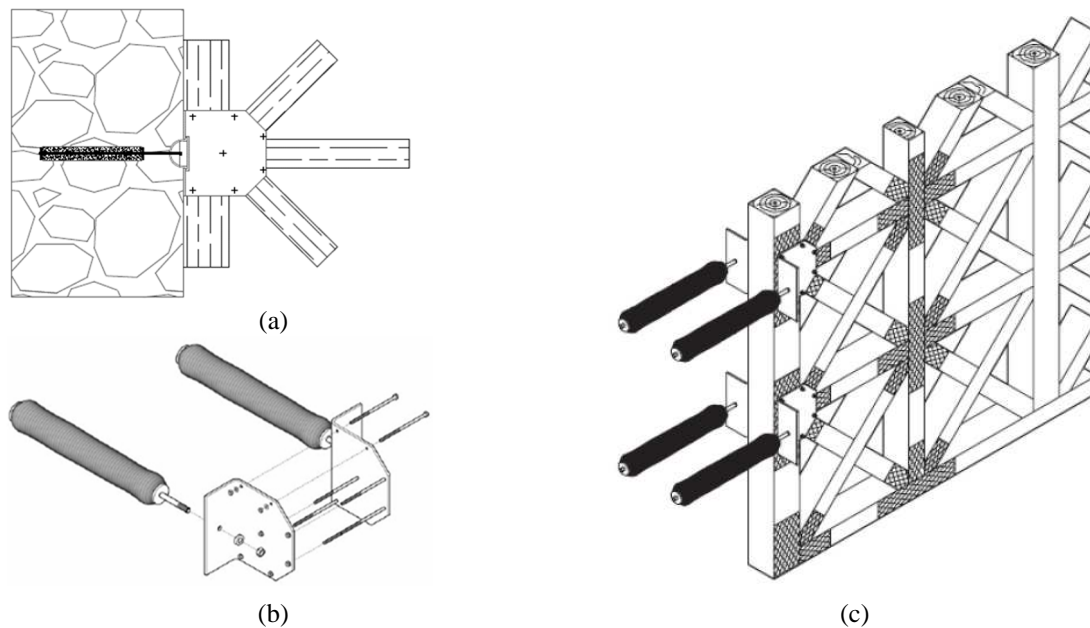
Strengthening solution: (a) Elevation view of masonry section and detail of half-timbered perpendicular wall; (b) Detail of the strengthening system, with a pair of anchors; (c) Detail of one connection applied to a half-timbered wall [23].
